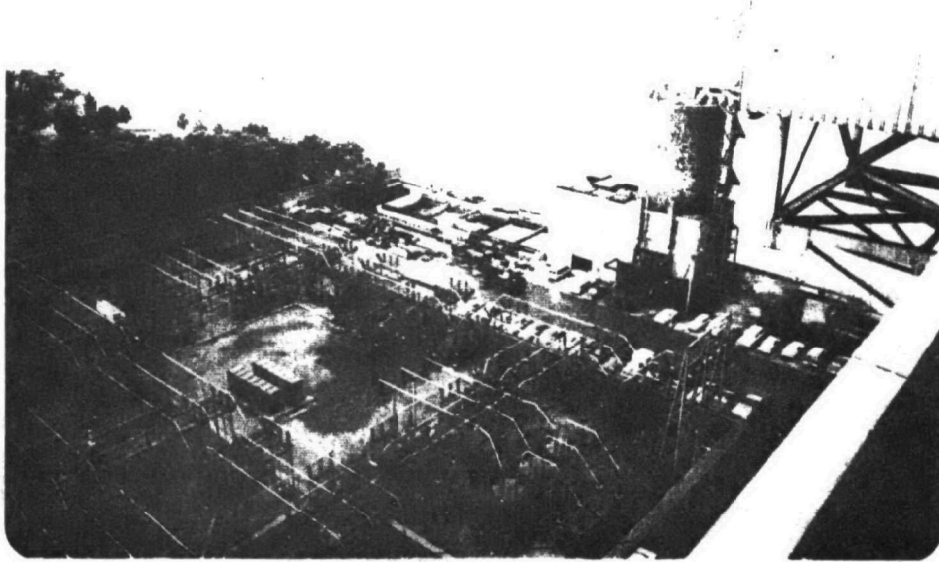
View from the boiler house roof looking southwest. The Vernon switch station is shown in the bottom left portion of the photo. The ash silo is shown just right of center.
